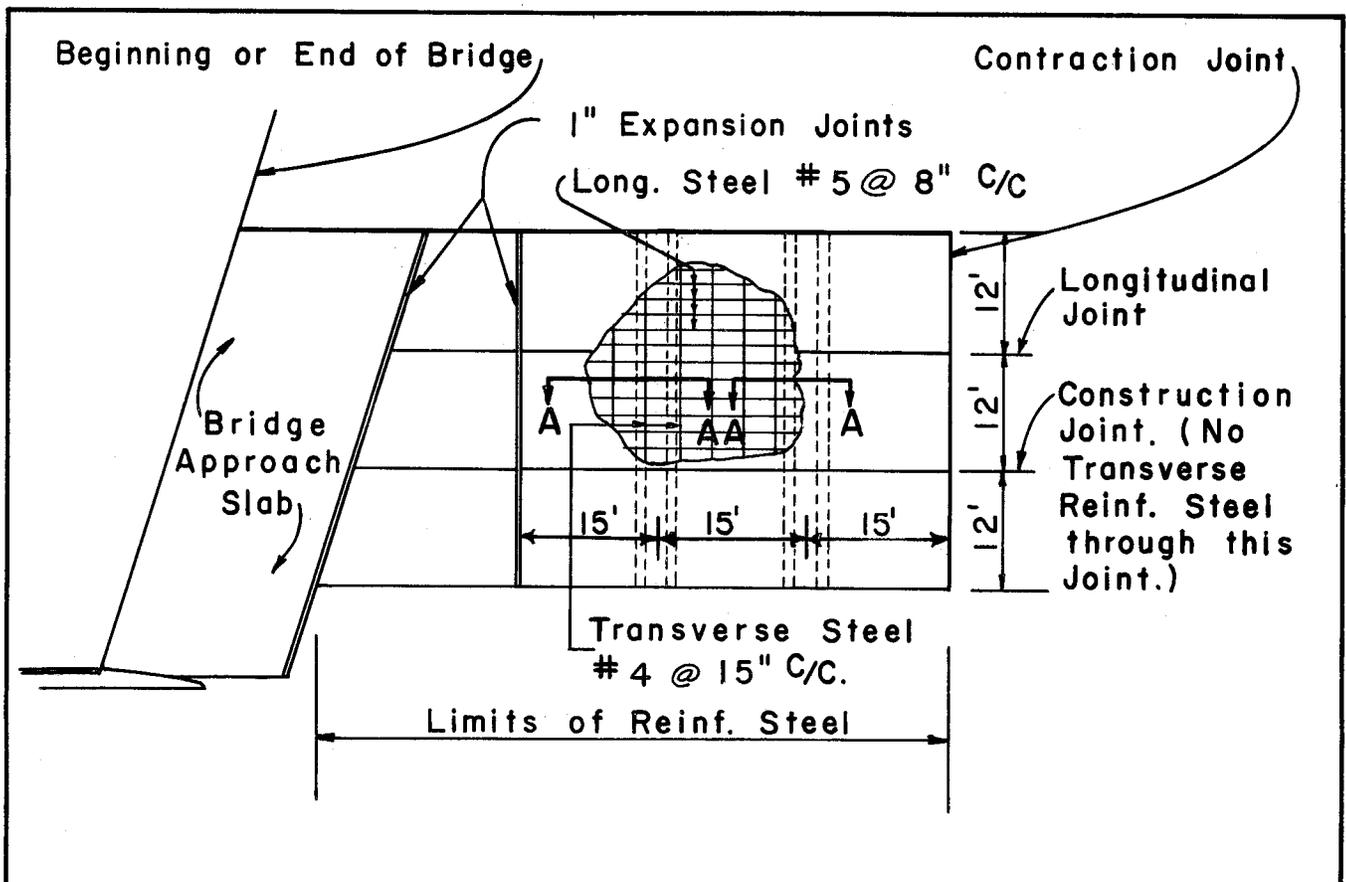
TYPICAL LUG DESIGN- JOINTED PAVEMENT
